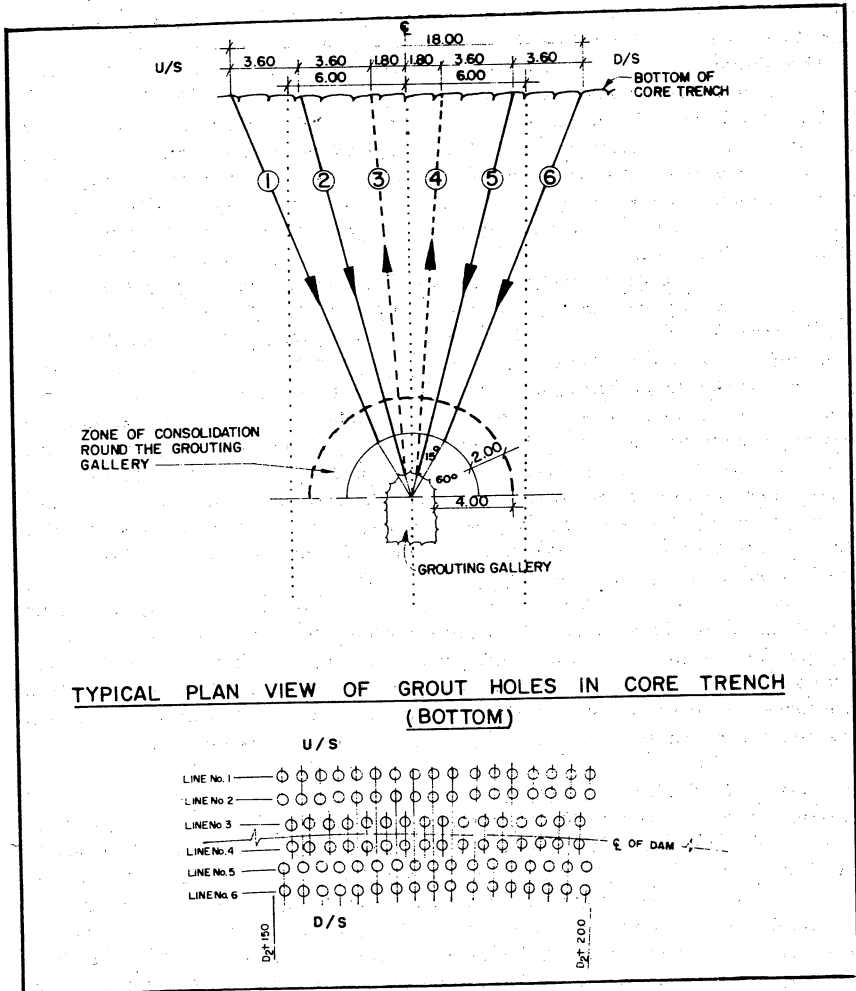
Typical Cross Section of the Upper Section of Deep Grout Curtain
